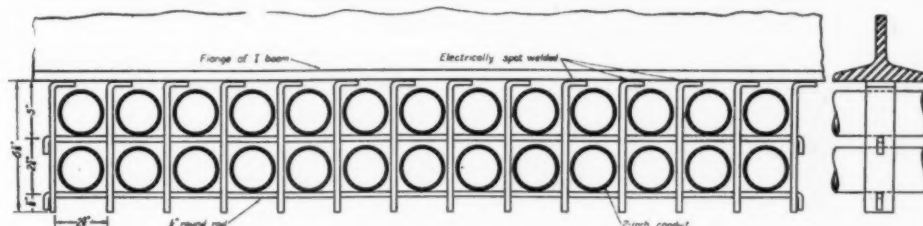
Rack support for conduits by means of which the bank of 26 conduits is supported next to ceiling, taking a minimum of space
